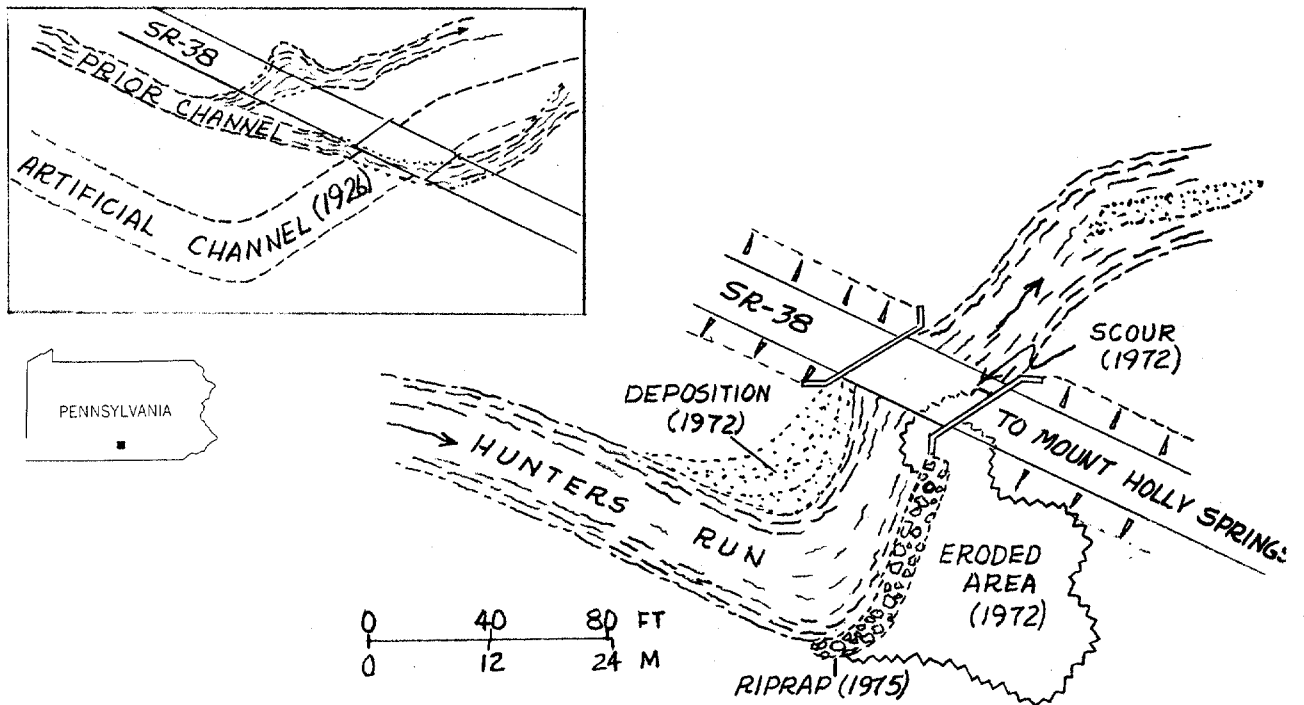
Right, plan sketch of SR-38 crossing at Hunters Run in 1976, and (upper left) channel alteration made in 1926 when SR-38 bridge was built.
